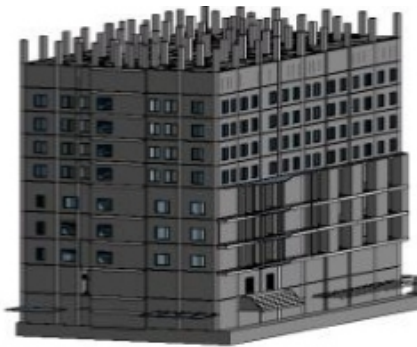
9th floor level beam Figure 34: 10th floor level and slab, 7th FL wall and floor and column and 9th floor level stair and 6th FL D & W for phase 23 shear wall, 8th floor level wall and floor and stair and 7th FL doors and windows for phase 24
